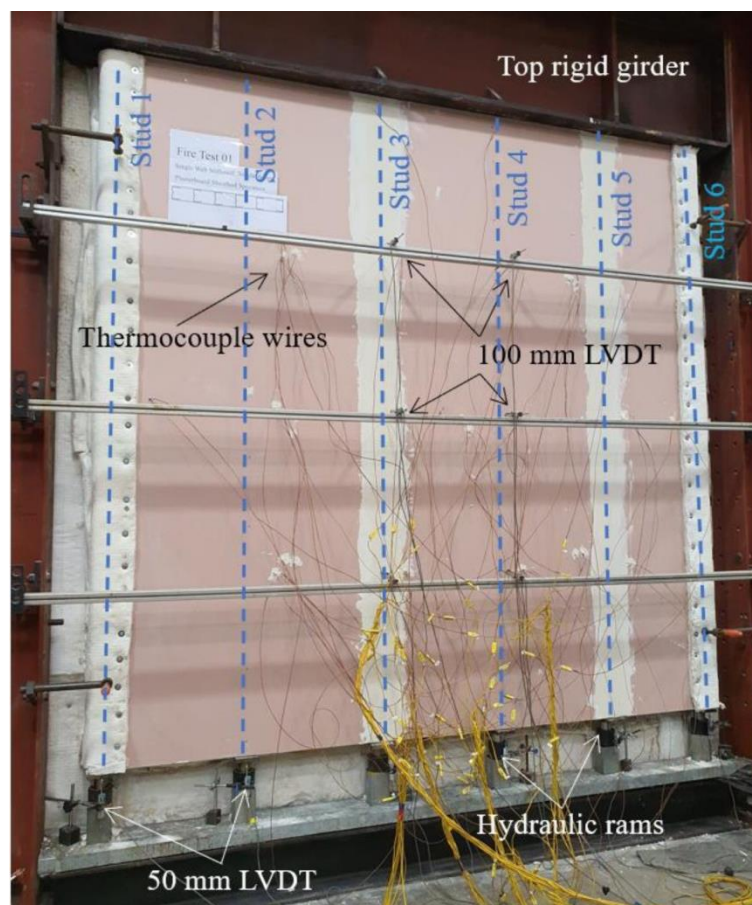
Full scale arrangement of LSF wall assembly (original figure from [4]).
